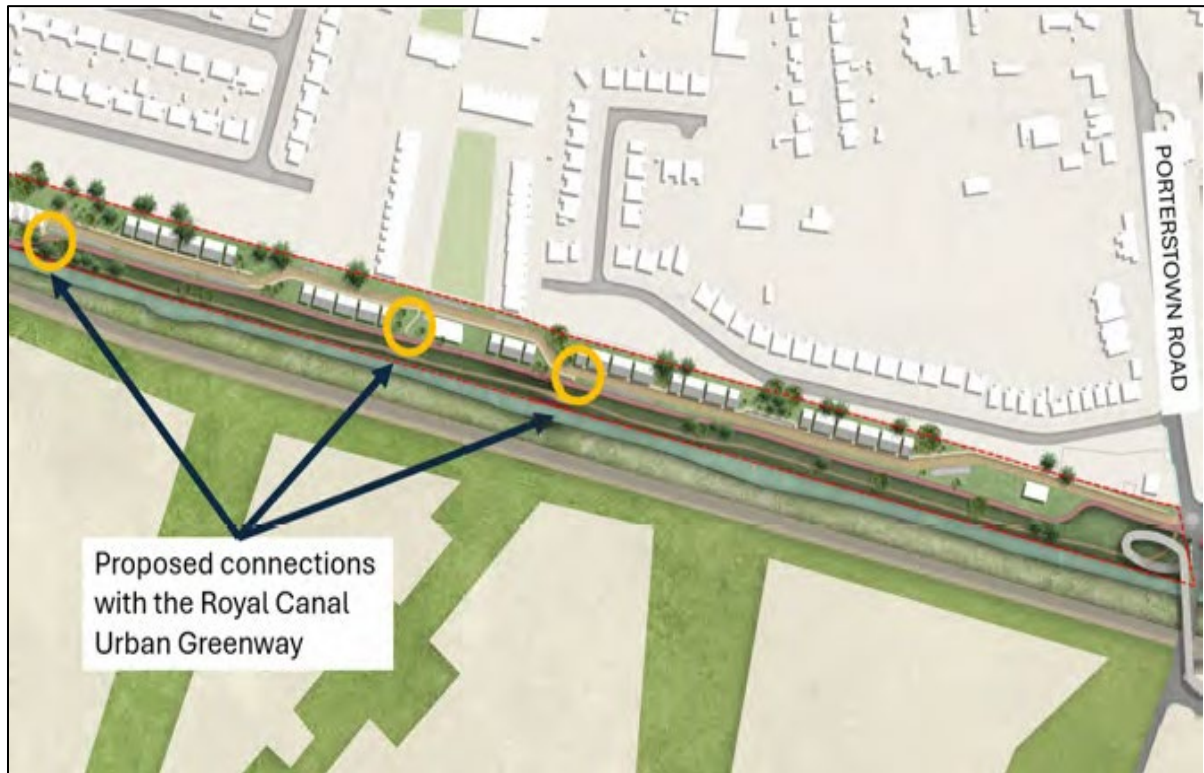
Proposed Connections with the Royal Canal Greenway (Extract from Figure 6-4 of the Draft Old School House Masterplan, FCC 2025)
